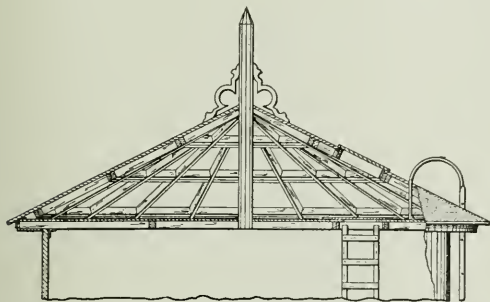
A Good Design of Double Roof for Elevated Tank.
